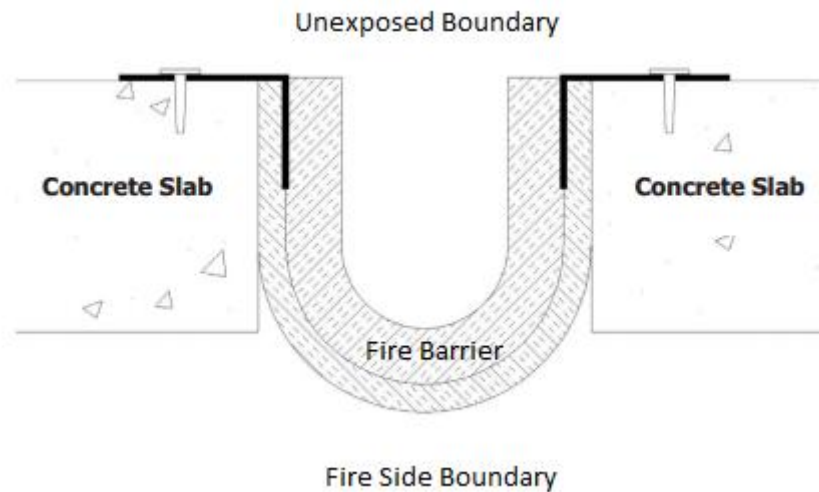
Illustration of Fire Barrier Design (Note: Cover Plate Not Shown)
